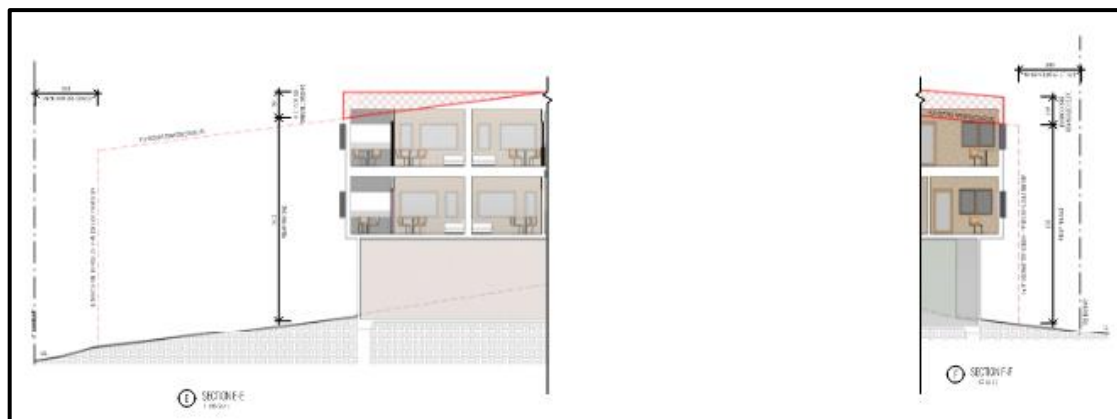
The 9.5 m height limit over 59 Cadbury Road, Claremont.
